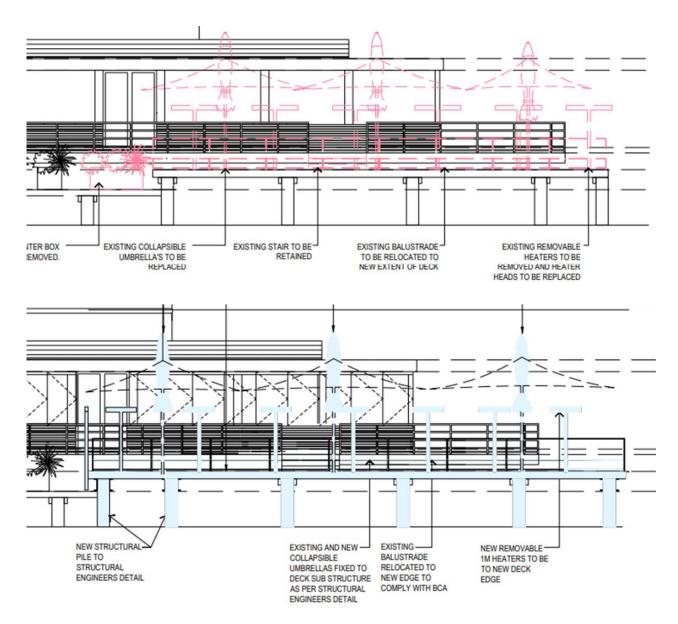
Northern elevation: demolition (above) & proposed (below).
